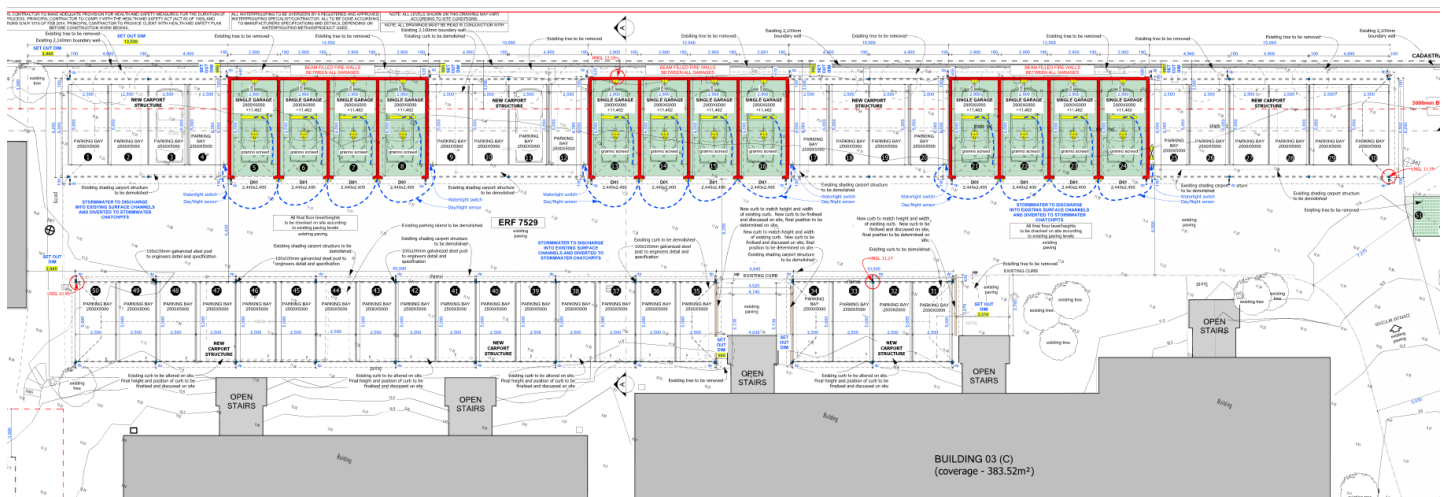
Site and ground plan indicating eighteen (18) carports and twelve (12) new garages encroaching the northern perimeter building line
